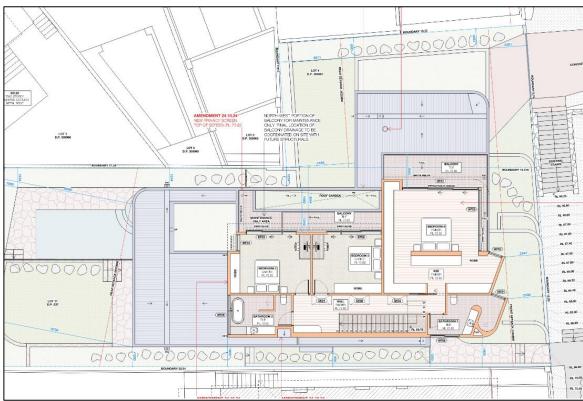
Extract of proposed ground level floor plan (Source: Baikie Corr Architecture and Interiors)
